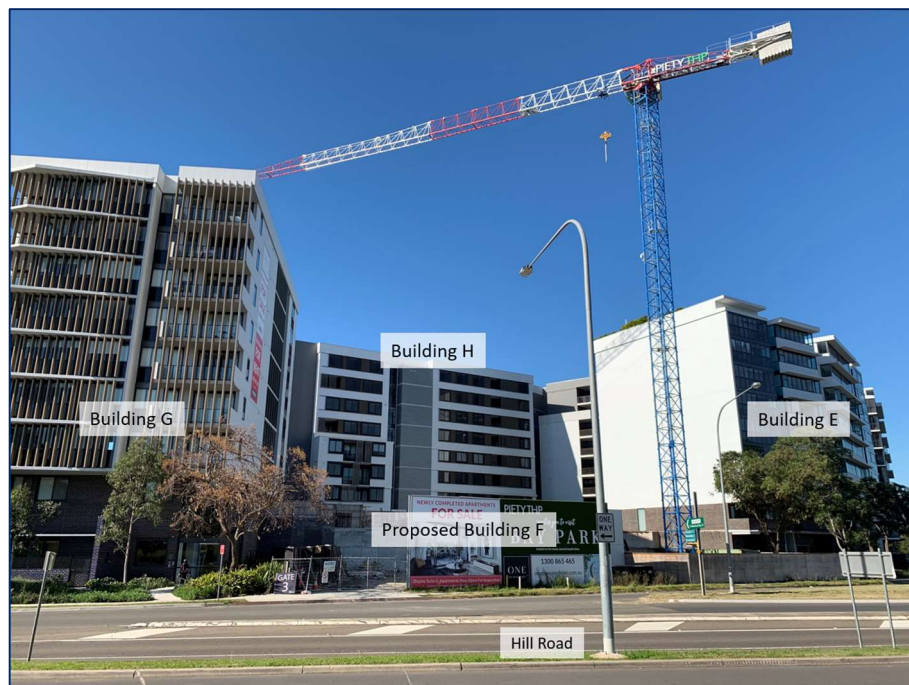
| View of completed Buildings G and E facing Hill Road, Building H in the background, with proposed location of Building F (Source: Department site visit)
